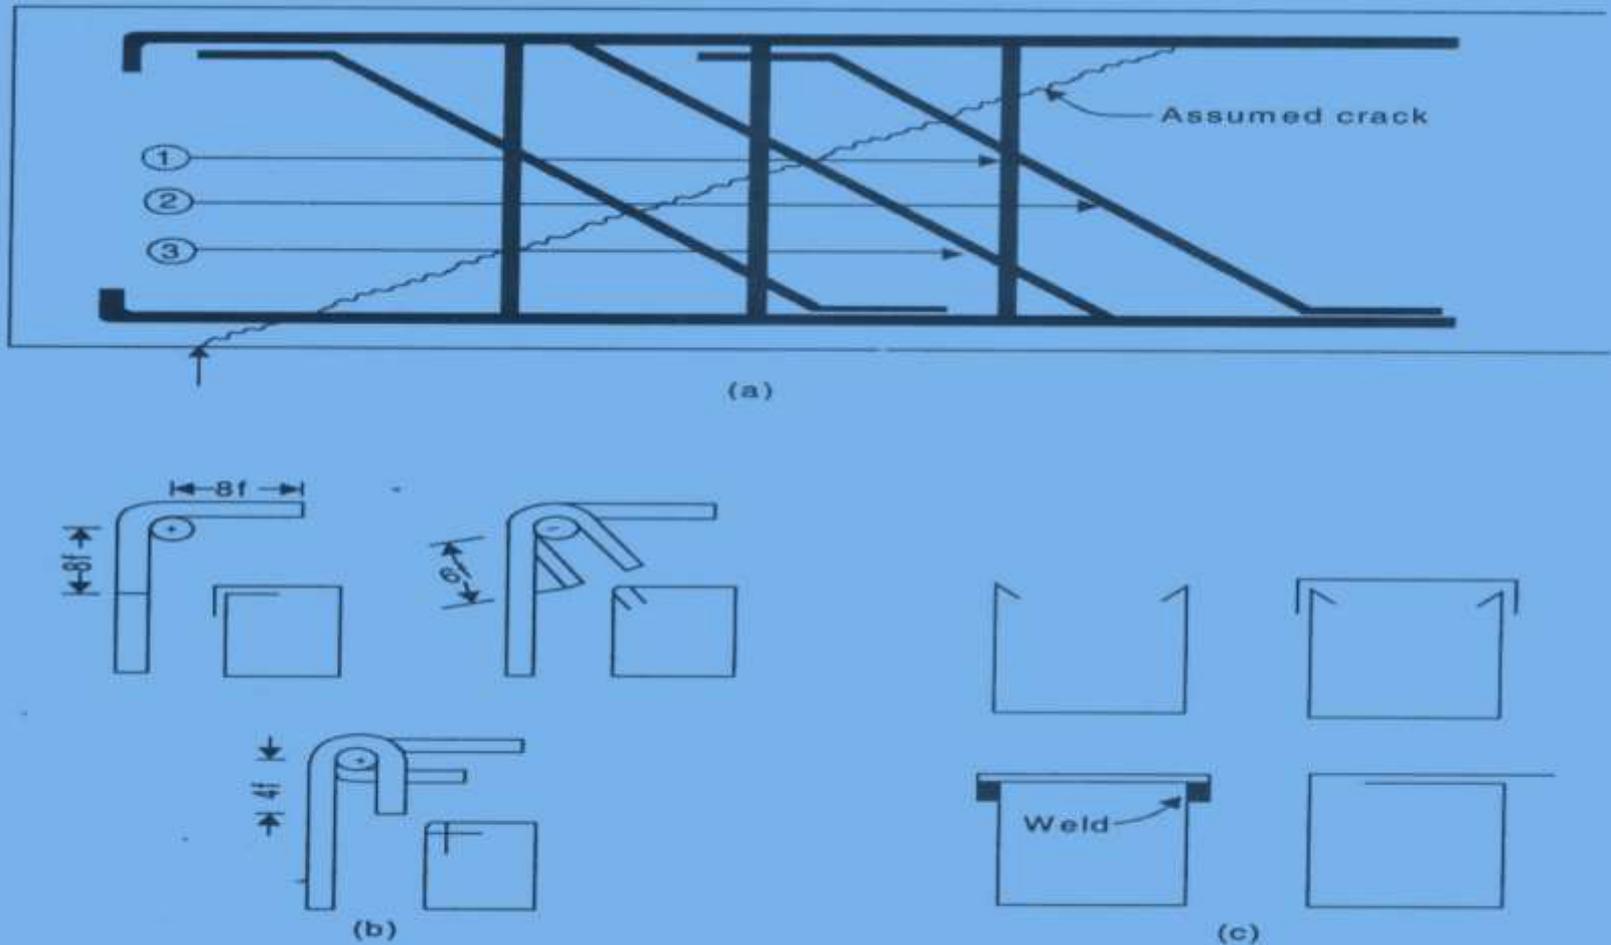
Types of shear reinforcements in beams: (a) Shear reinforcements—(1) system of vertical stirrups; (2) system of inclined stirrups; (3) bent-up tension bar; (b) Detailing of ends of conventional types of stirrups; (c) Some special shapes of stirrups.
